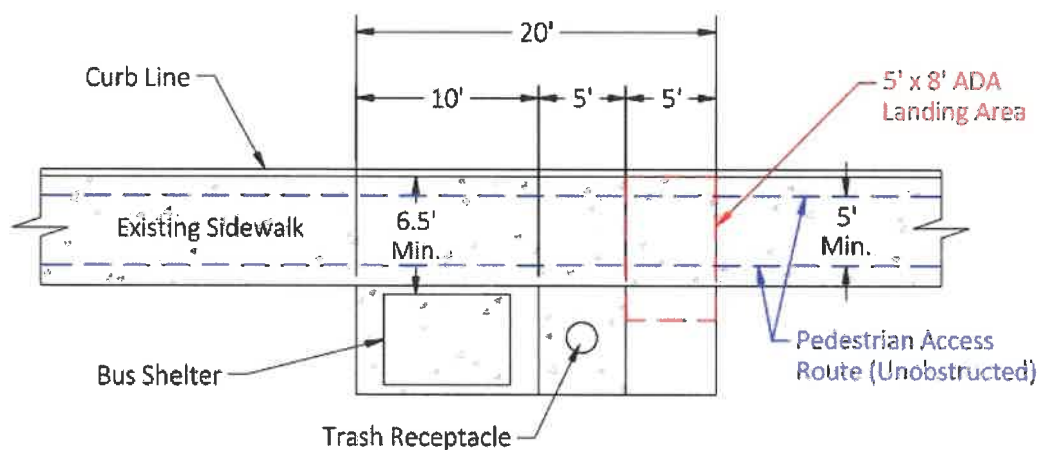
Curb-Tight Sidewalk with Shelter and Waste Receptacle
